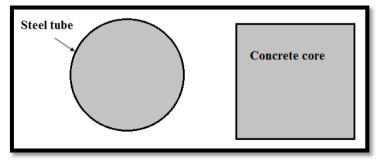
Typical cross-sections of concrete filled steel tube columns.
